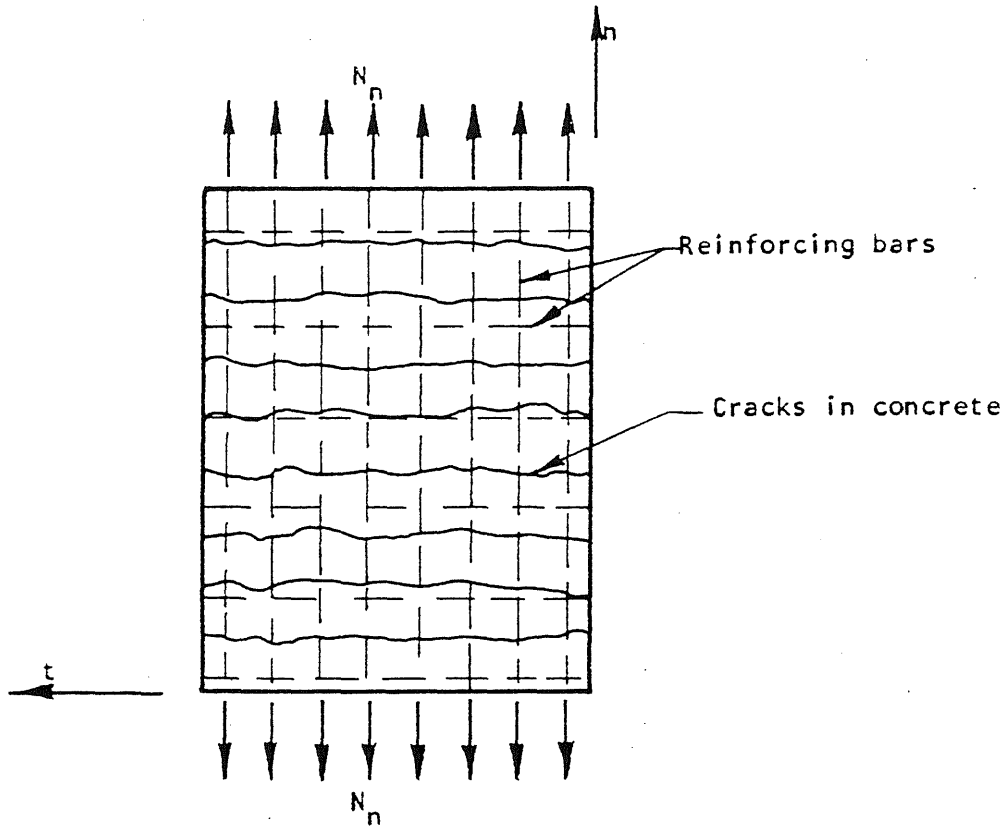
REINFORCED CONCRETE PLATE ELEMENT IN TENSION
